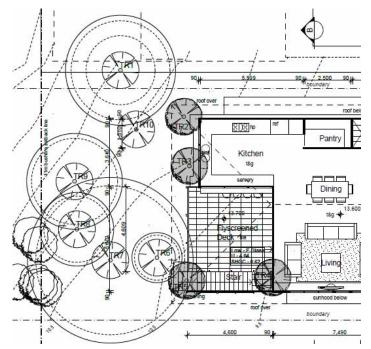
excerpt from First Floor Plan WD11.02 Revision E dated 23 April 2014
